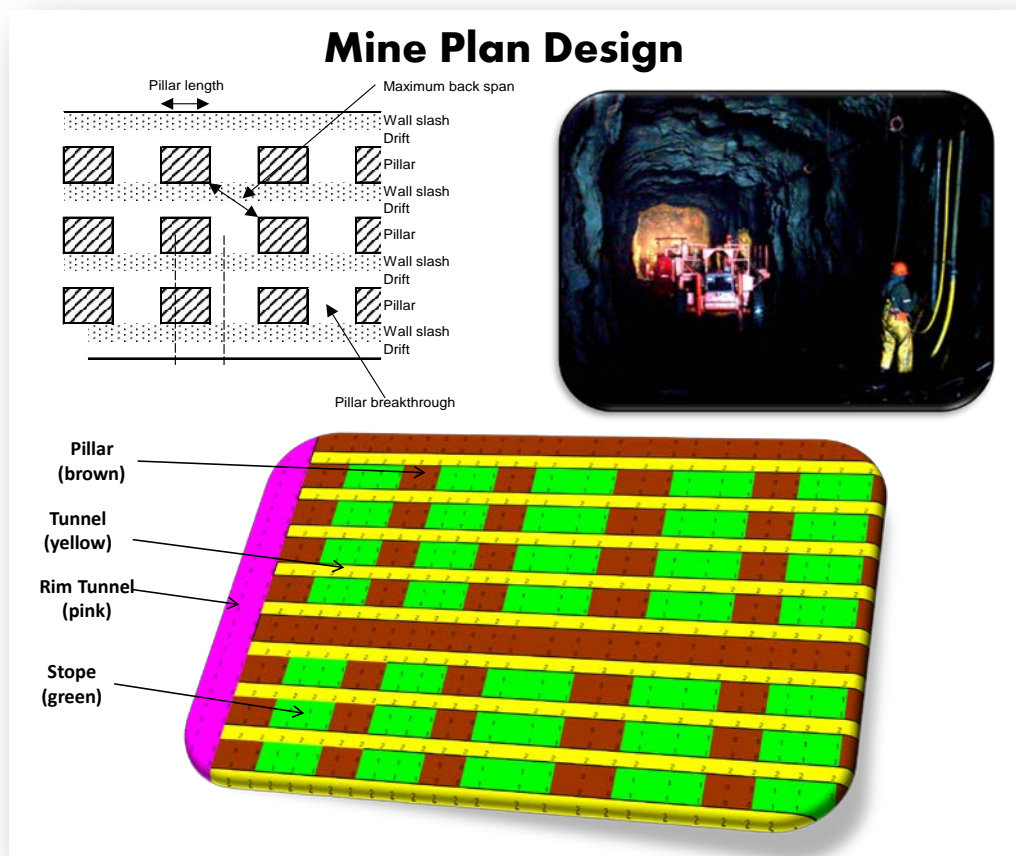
A 2-D plan view of the mining depletion programme created in MS Excel based on an actual mine plan incorporating a conventional room and pillar underground mining technique combined with ‘slash and drift’ mining techniques to deplete narrow dykes while minimizing dilution. The top right insert shows an actual photograph taken of an access tunnel in the underground mine.
